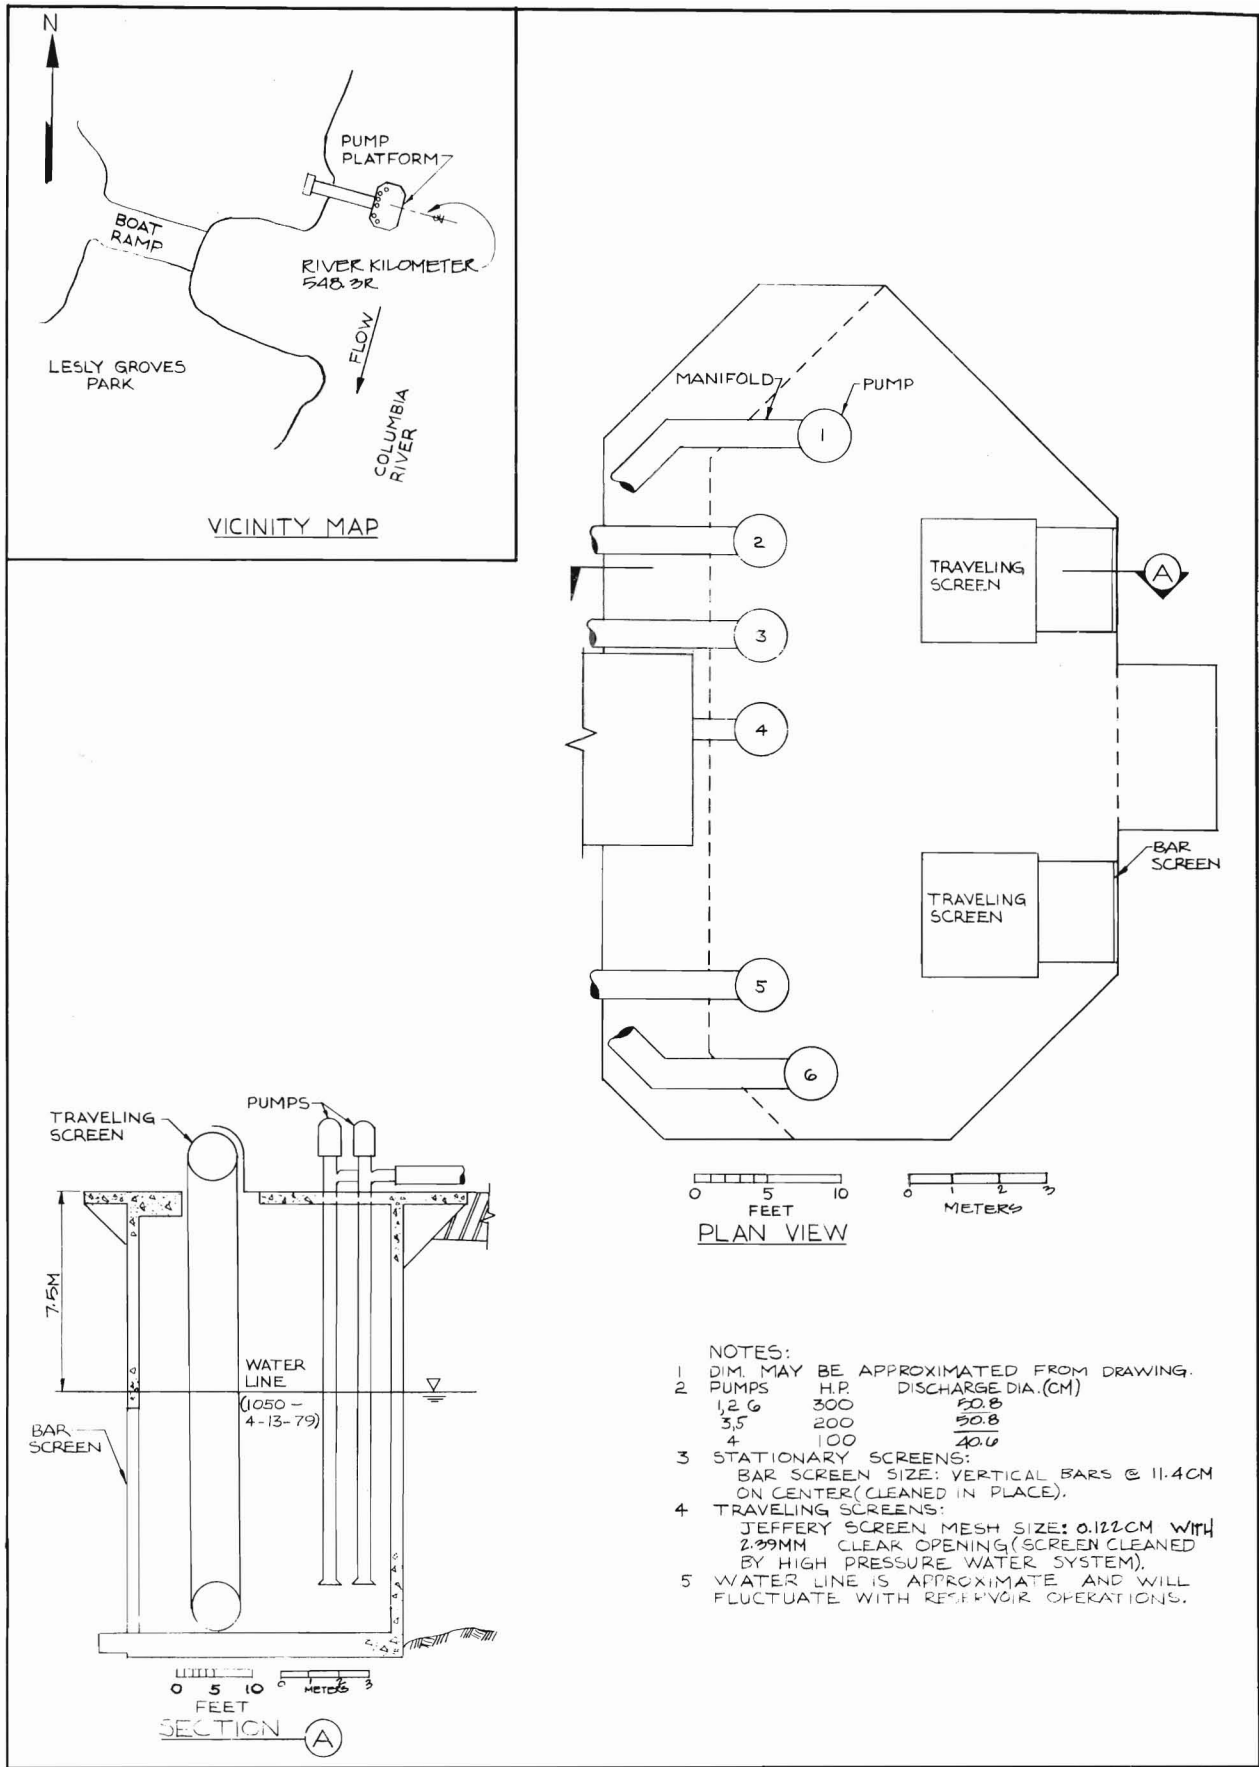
Water withdrawal plan, City of Richland, Washington (river mile Col340.8R).
